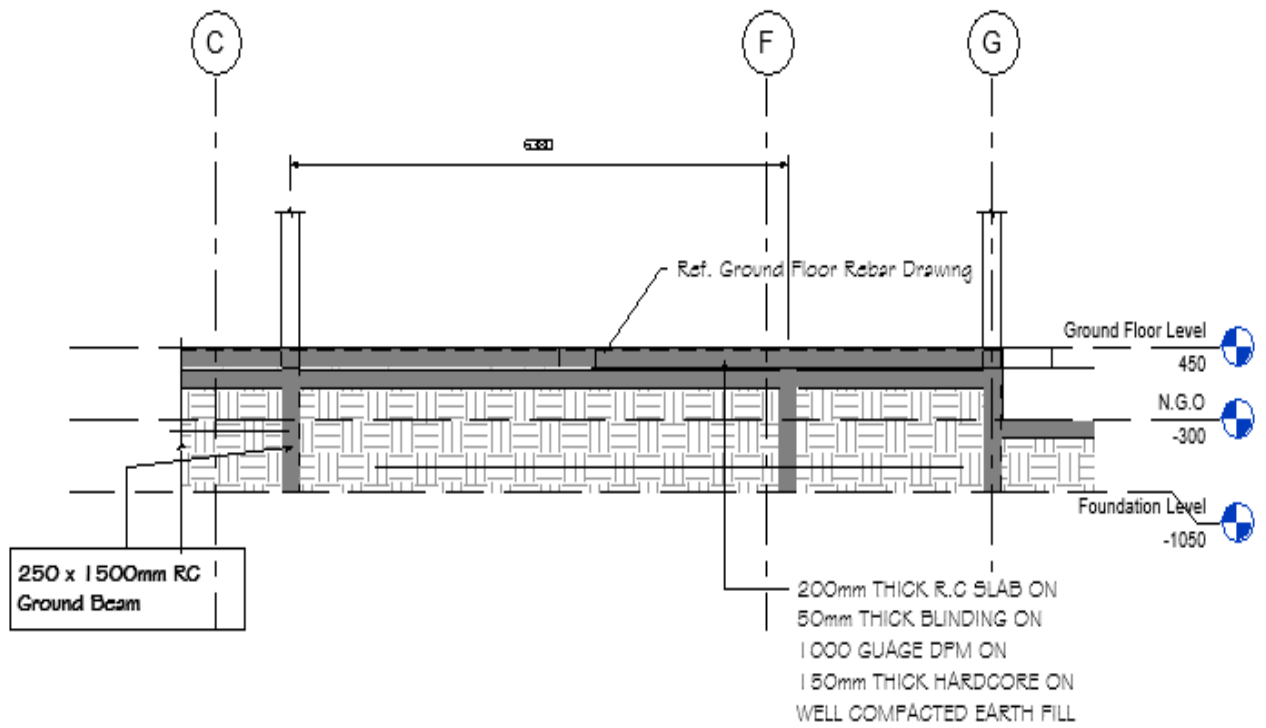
TYPICAL SECTION OF THE FOUNDATION OF THE BUILDING
